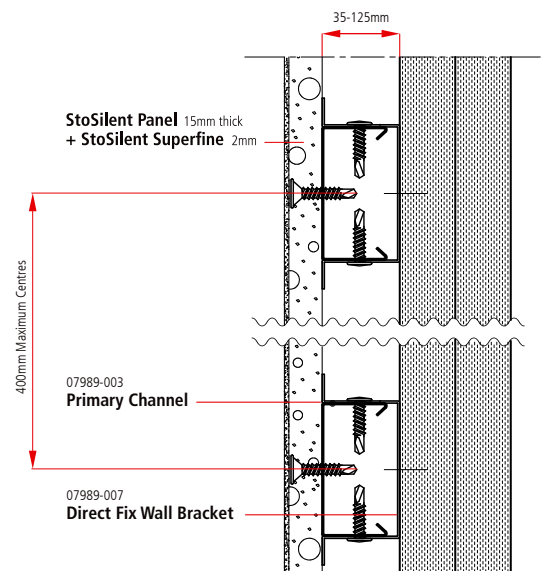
Fig B. Typical wall mounted acoustic solution by Sto-Direct Fix Wall Brackets.
